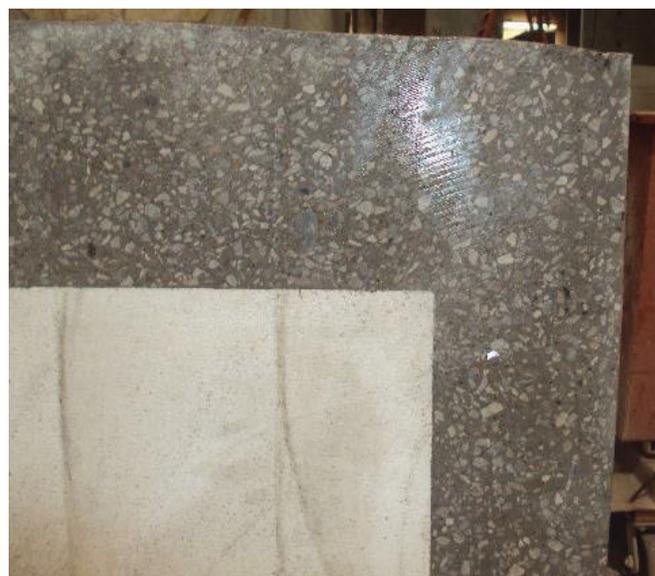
Saw cut in the bridge box girder specimen showing top and bottom corners.
